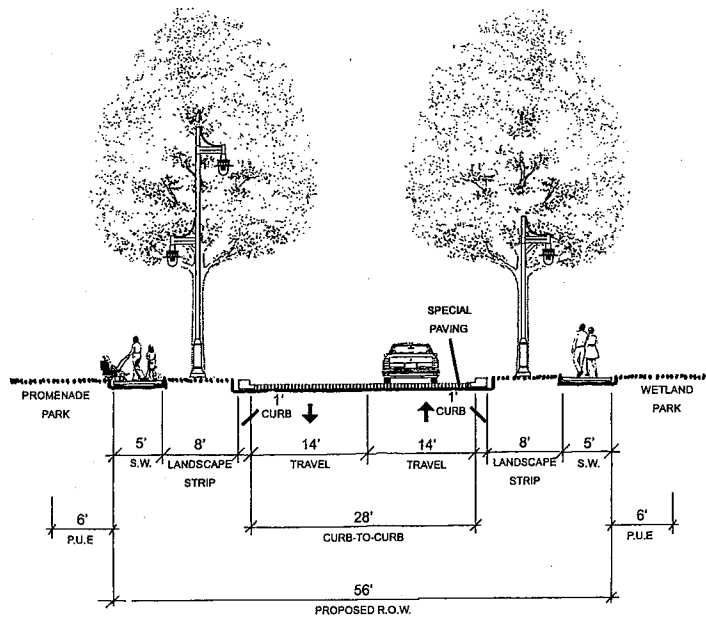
D.New.m: Harbor Way Cross Section at Park (4)
